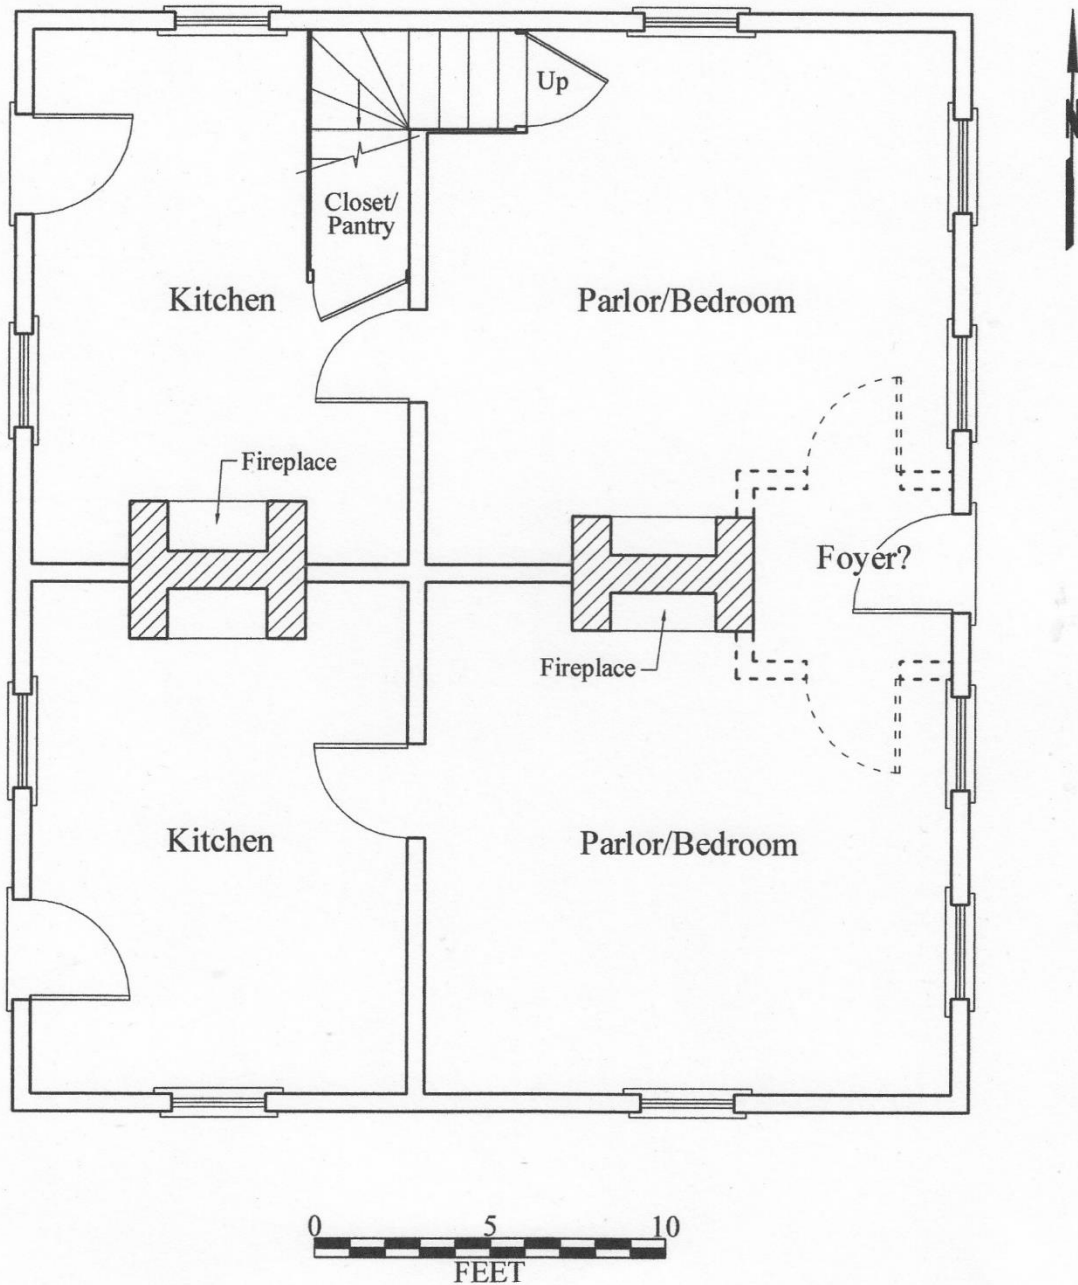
Conjectural first-floor plan of House D, showing it partitioned into two living units, as the dwelling appears to have been by circa 1870. A foyer may have been built out around the front entrance in order to allow private access to each of the units, though this is speculative. As noted earlier, the location and configuration of the stairway is speculative. An alternative possibility is that the stairway rose from the kitchen, as opposed to the parlor.
